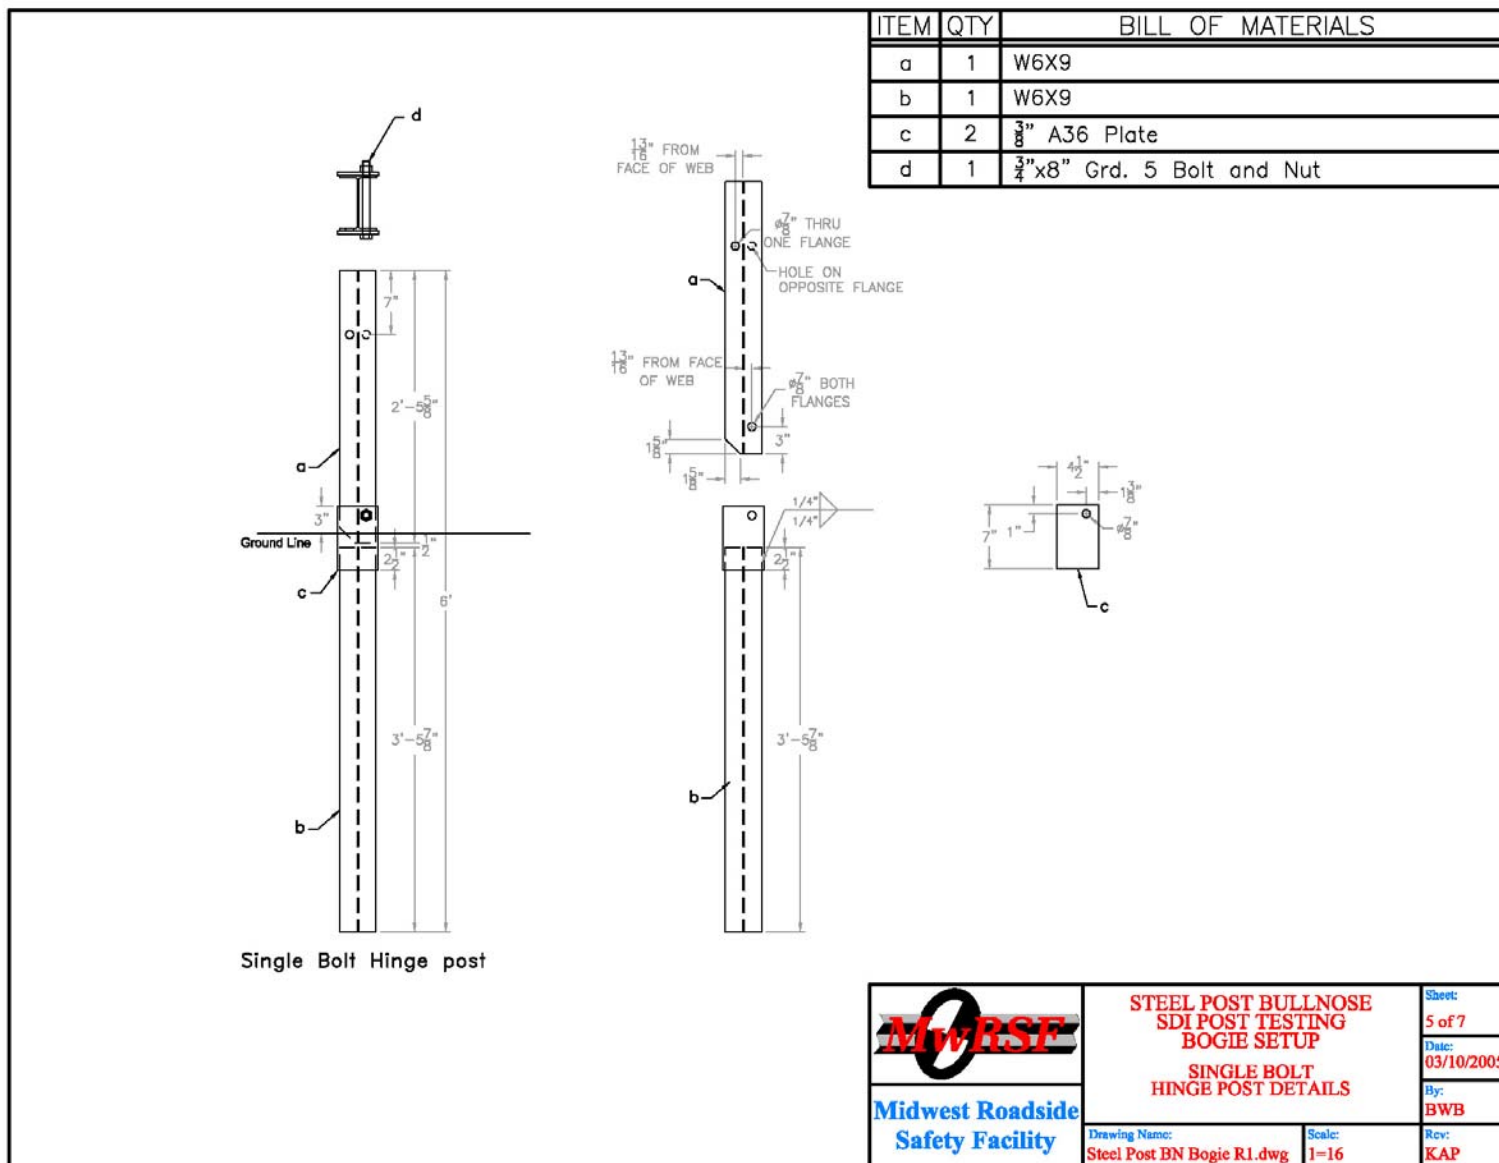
Breakaway Post Component Testing, Hinged Steel Post Design
